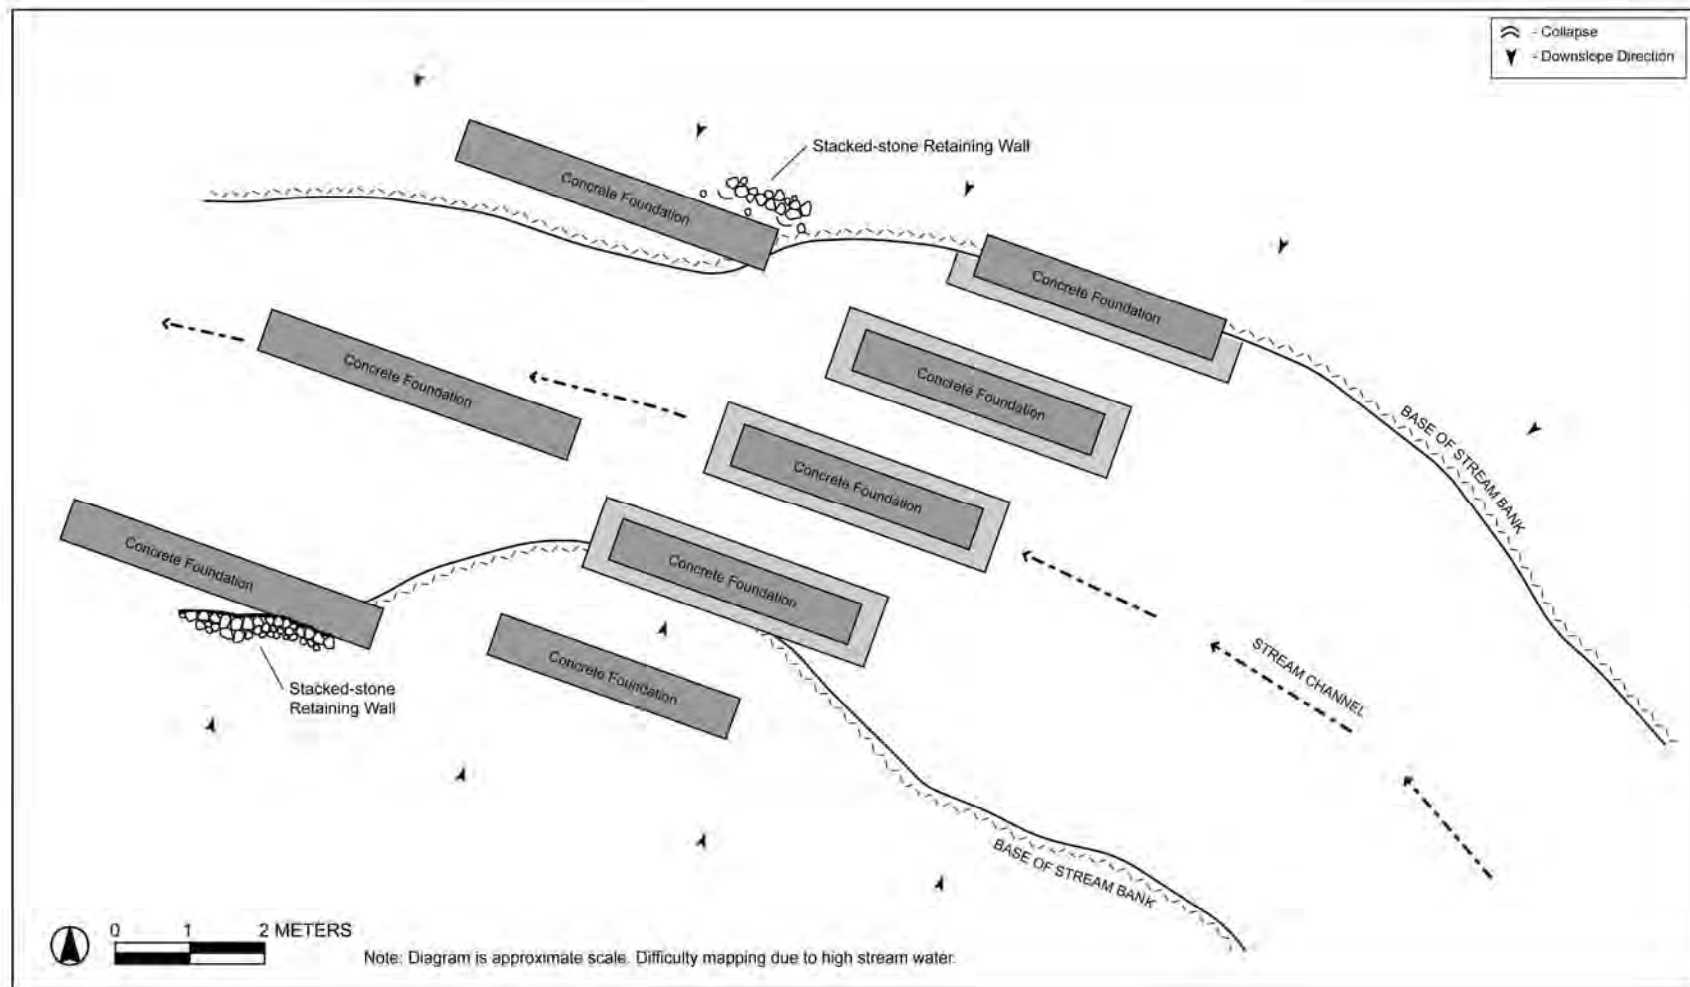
Plan-view diagram of SIHP # 50-80-09-9530 G railroad and road bridge foundations
